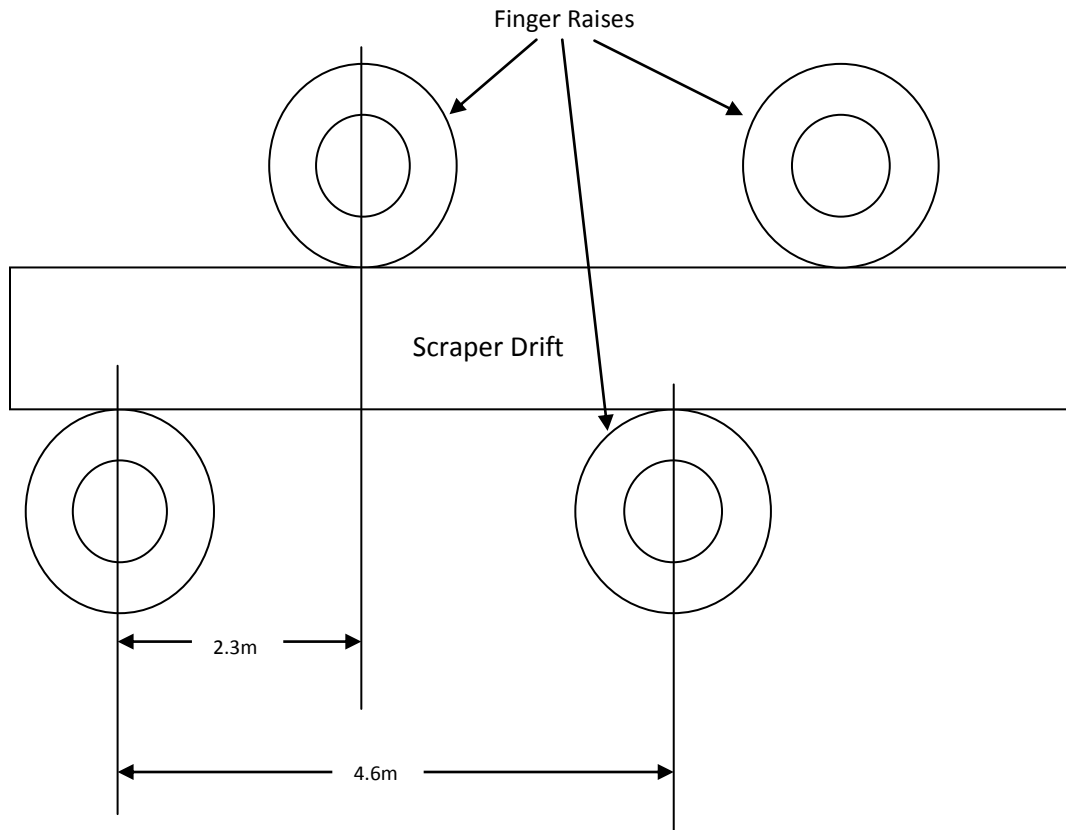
Plan view of drawpoint spacing along scraper drift - sketch
